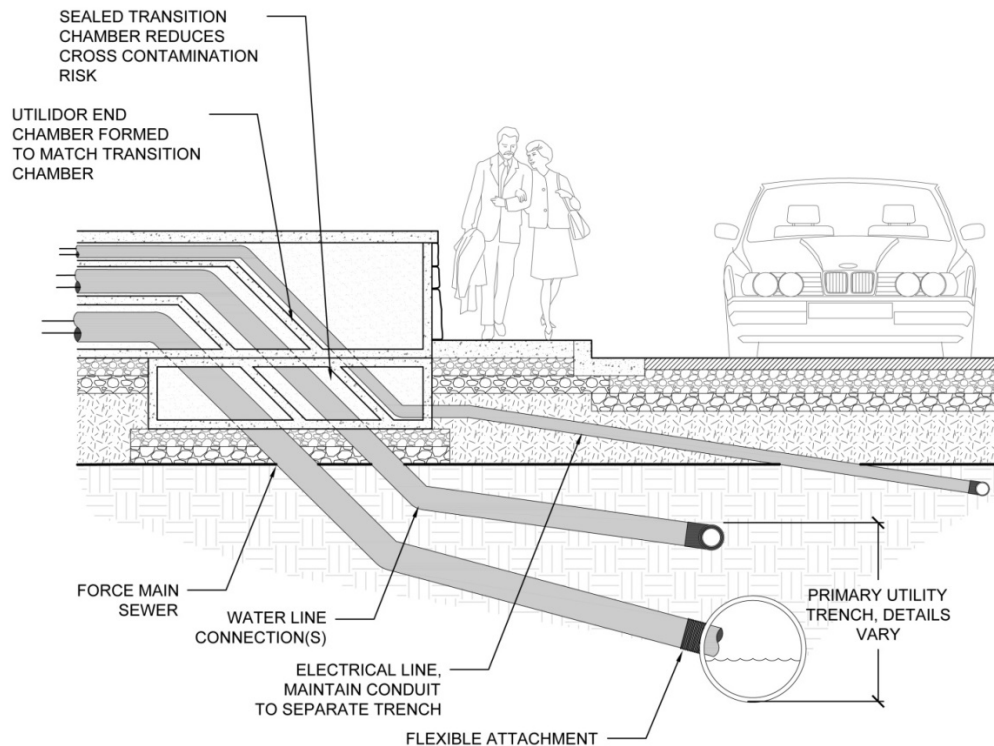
Barrier connection to main infrastructure system. Again utilizing a transition chamber, the barrier utilidor can create connections with minimal to no soil disturbance. For barrier to vault connections, refer back to Figures 48 and 49 on page 96.
